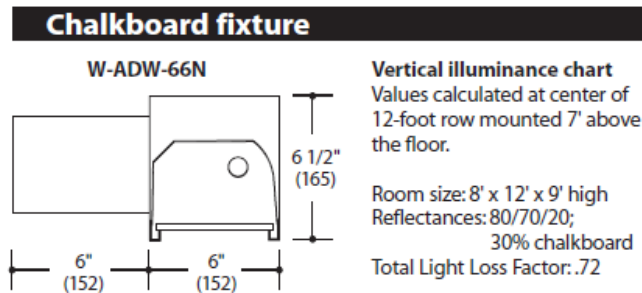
BOARD WASH LUMINAIRE DETAIL
